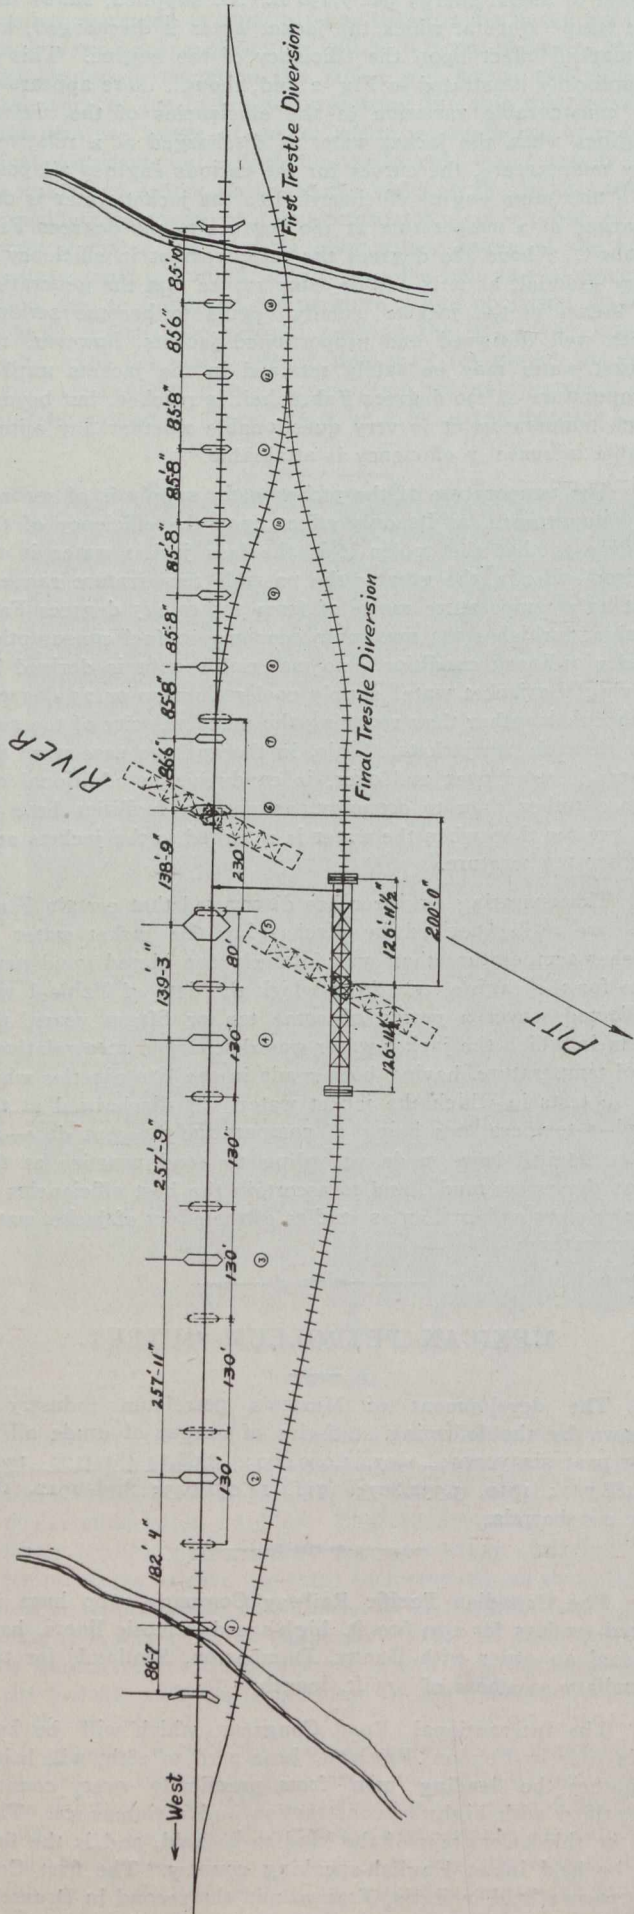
Layout of C.P.R. Pitt River Bridge, Coquitlam, B.C.
